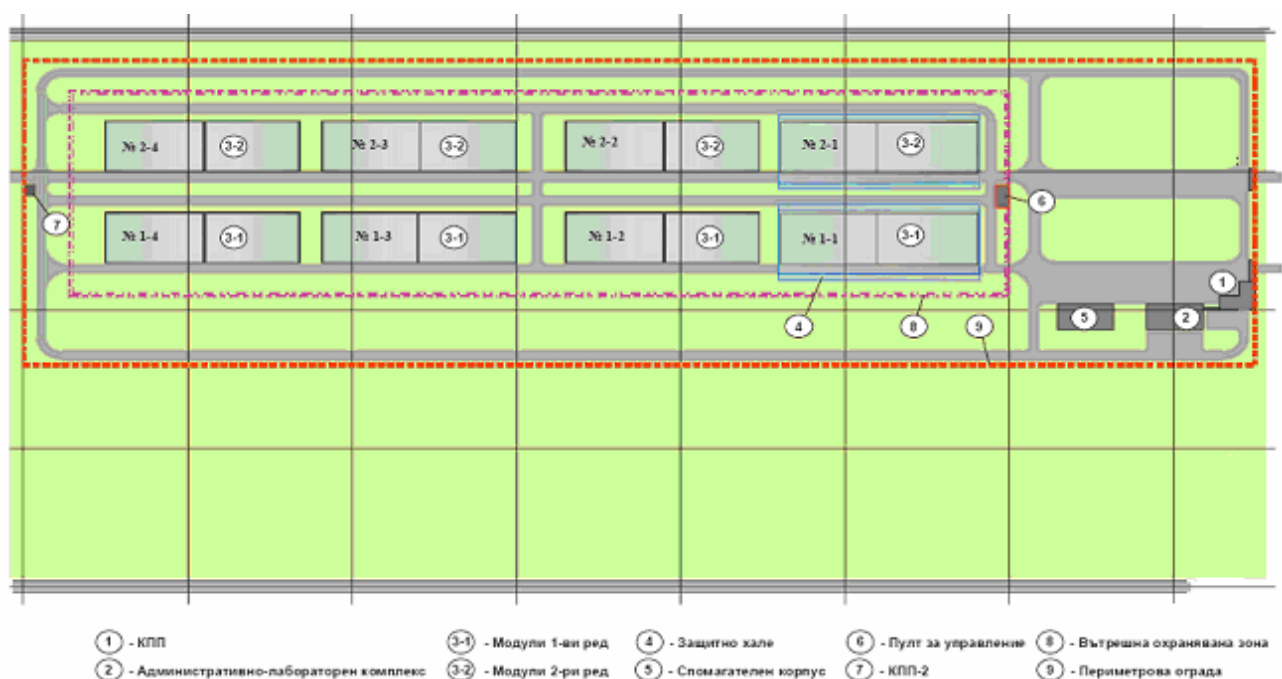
Positioning of equipment on the general plan of the NRRAW
